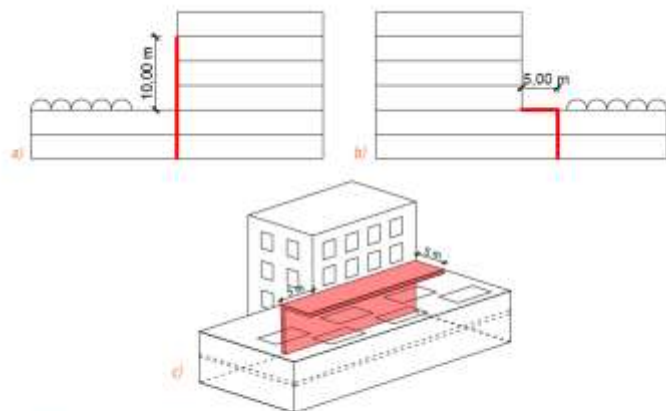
Preventing fire spread from a lower to a higher building a) by building a firewall in a higher building positioned between buildings of different heights, b) by building a horizontal fire barrier in a lower building and c) axonometric illustration of a typical firewall built on a lower building
